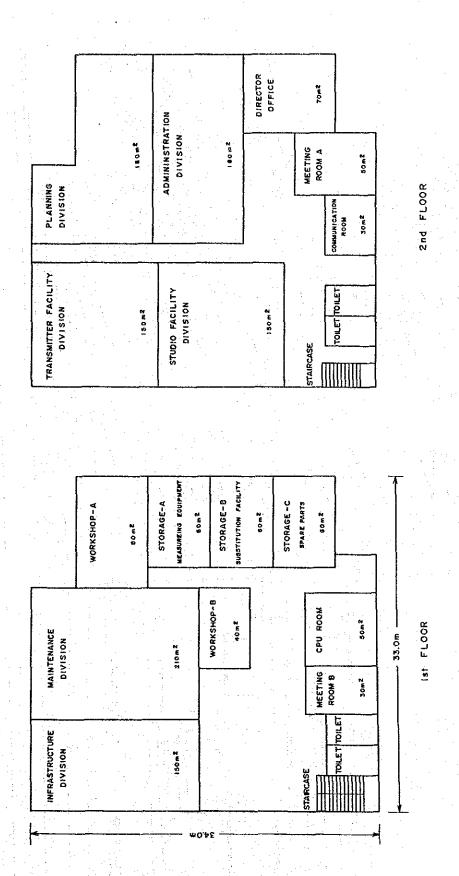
The Floor Layout of EC Headquartes (RRI RADIO DALAM)
